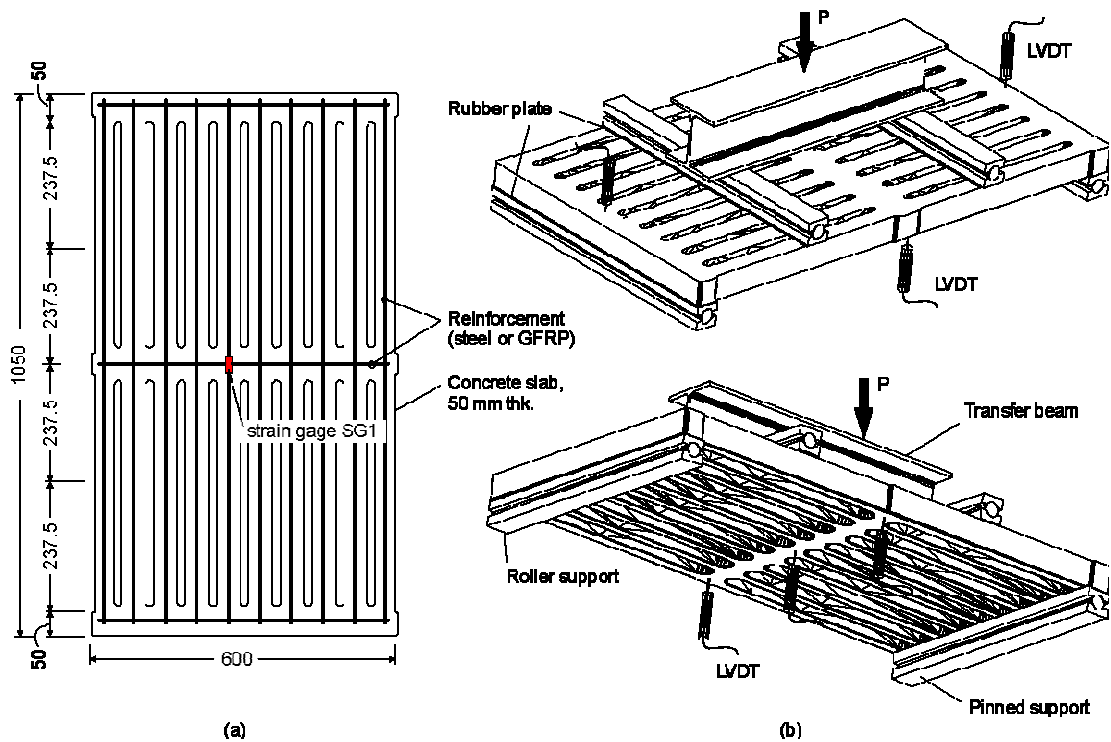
Typical a) plan view and reinforcement details of slabs, and b) 3D view of test setup and instrumentation from top and bottom of slabs.
